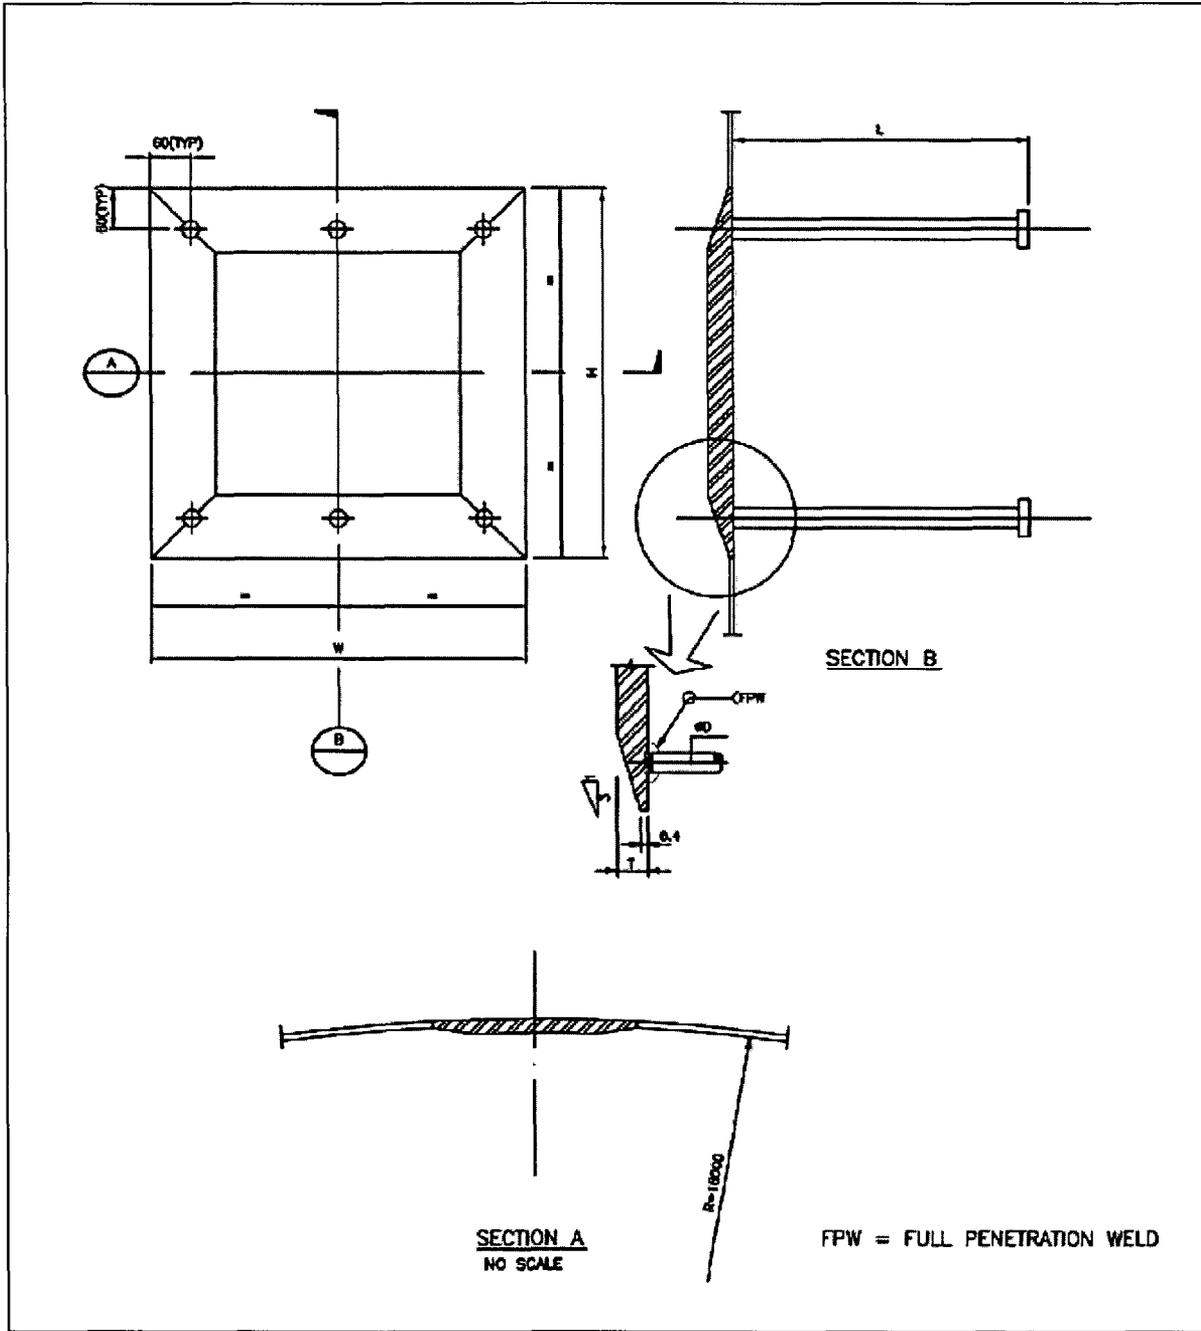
Typical Internal Containment Plate Support with Embedment Integral with Containment Liner
